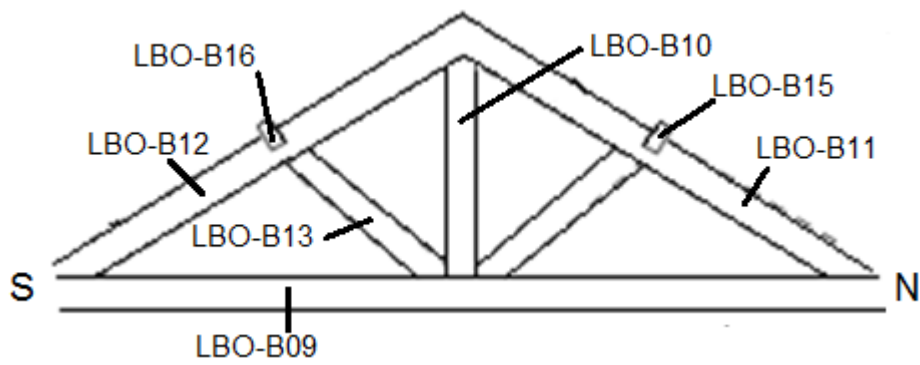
Former farmhouse, truss 1, showing the position of samples LBO-B09–13 and LBO-B15–16
